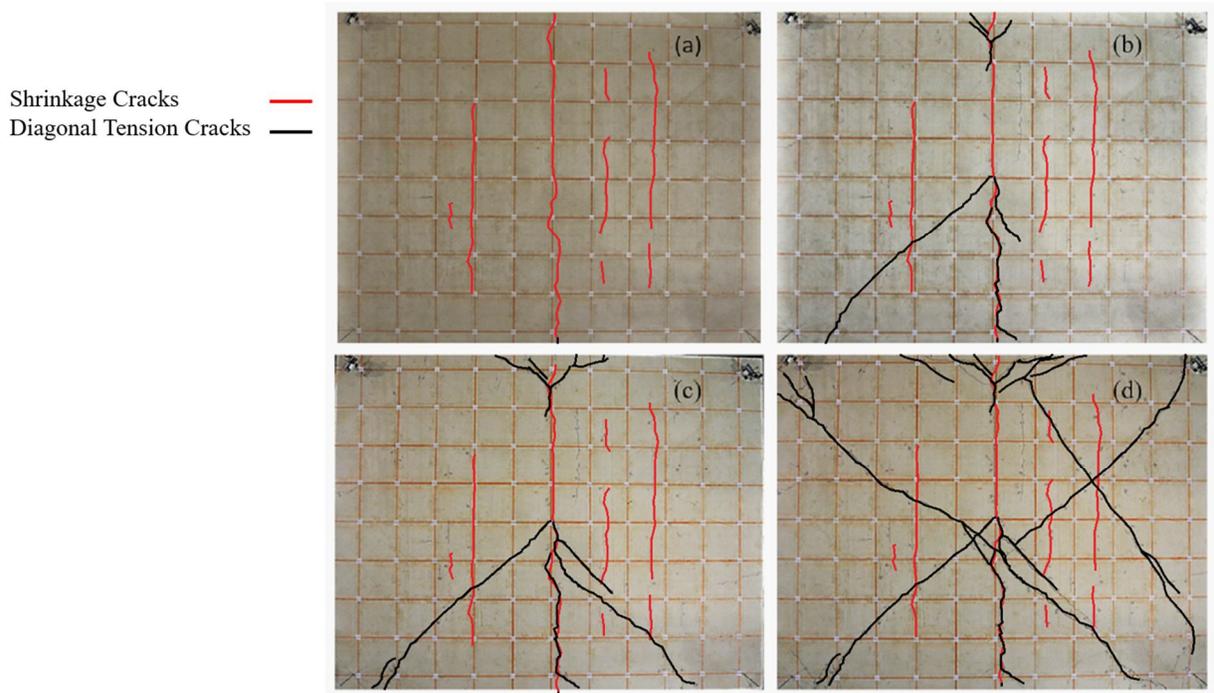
Progression of failure for specimen 3/6.25-4-L-NF-DT. (a) Before testing. (b) First appearance of diagonal tension cracking. (c) First appearance of diagonal tension cracking in opposite direction. (d) Crack pattern past failure
